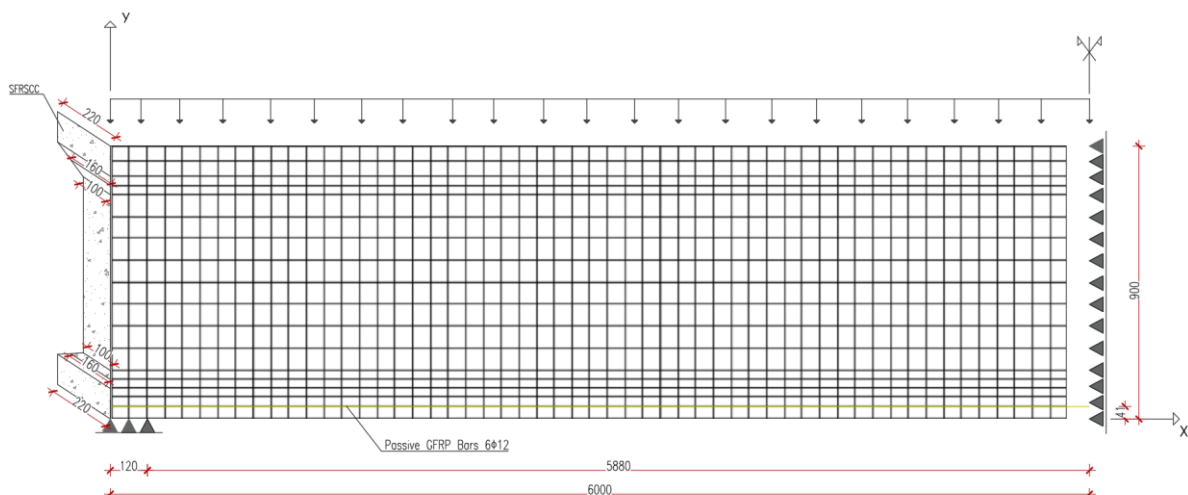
Geometrical details of the SFRSCC beam reinforced with passive GFRP bars (dimensions in mm).
